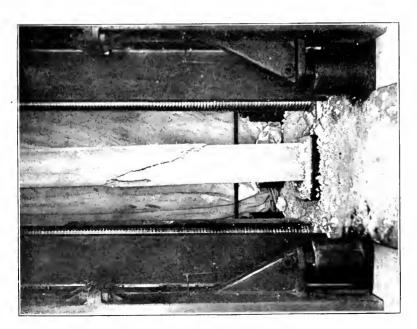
Views Showing Column No. 7 and 16 after Failure.
